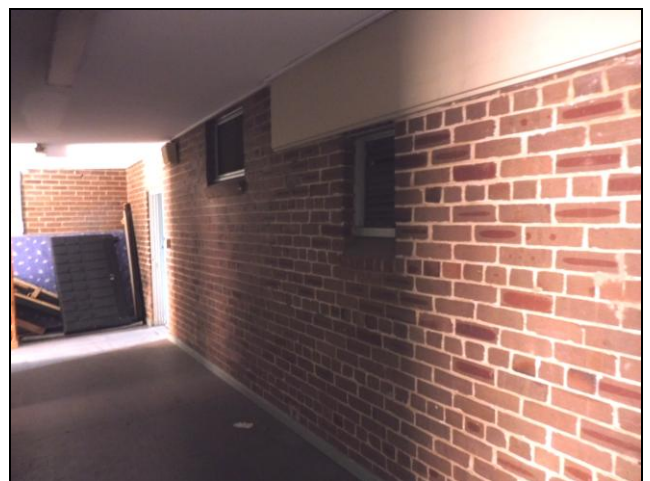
Differing brickwork further along the northern façade of the rear wing and bulkhead occurs in line with what is assumed to be an early, skillion roofed addition. The bulkhead/ infill is assumed to have been added as part of the c. 1997 works.
